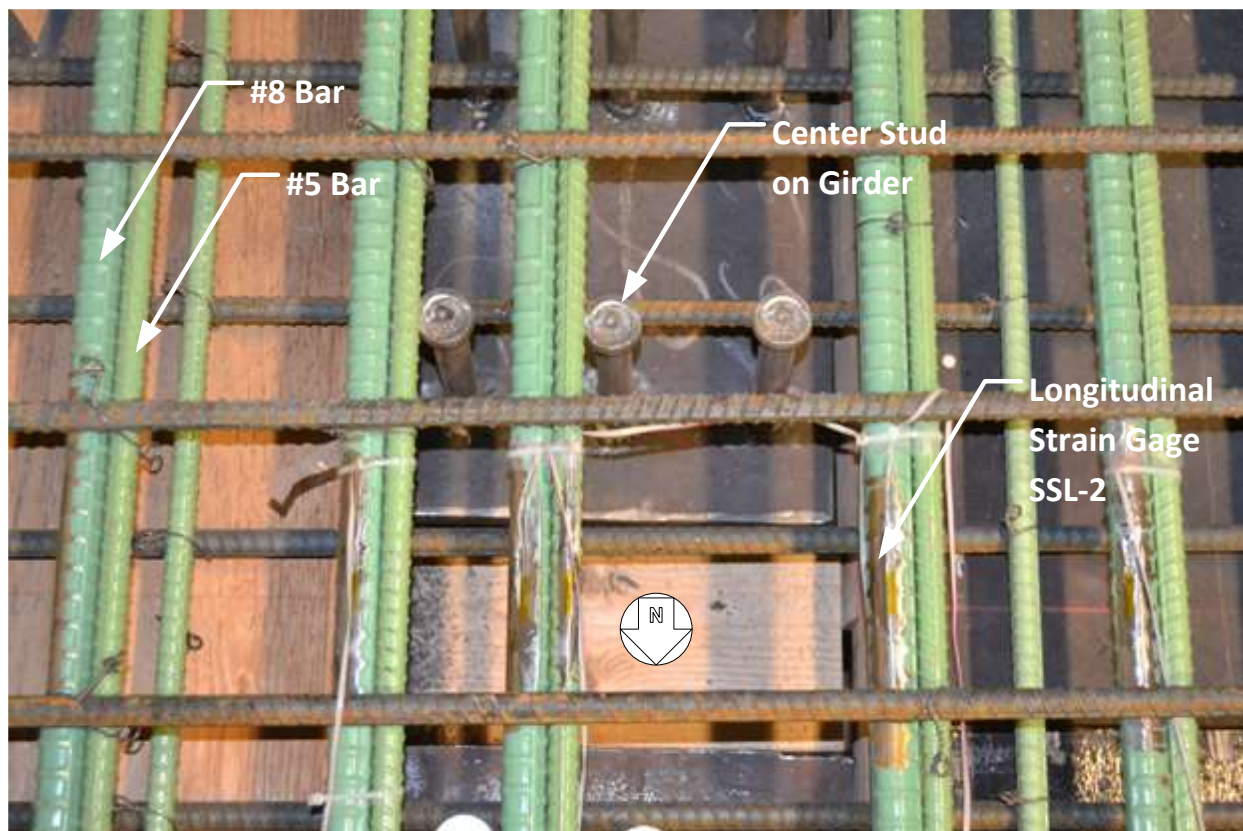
Strain Gages Attached to Reinforcing Steel
